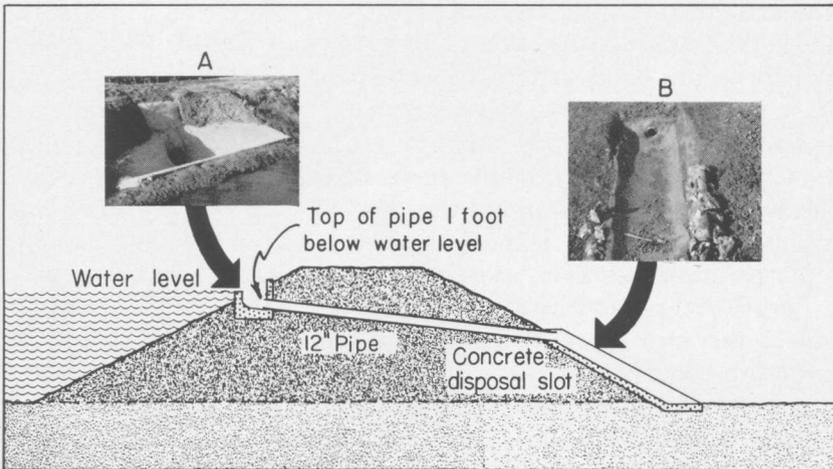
Cross section through completed dam shows location of the permanent over-flow slot. "A" is the concrete slot and lip; "B" is the concrete trough that carries the water away from the dam.
